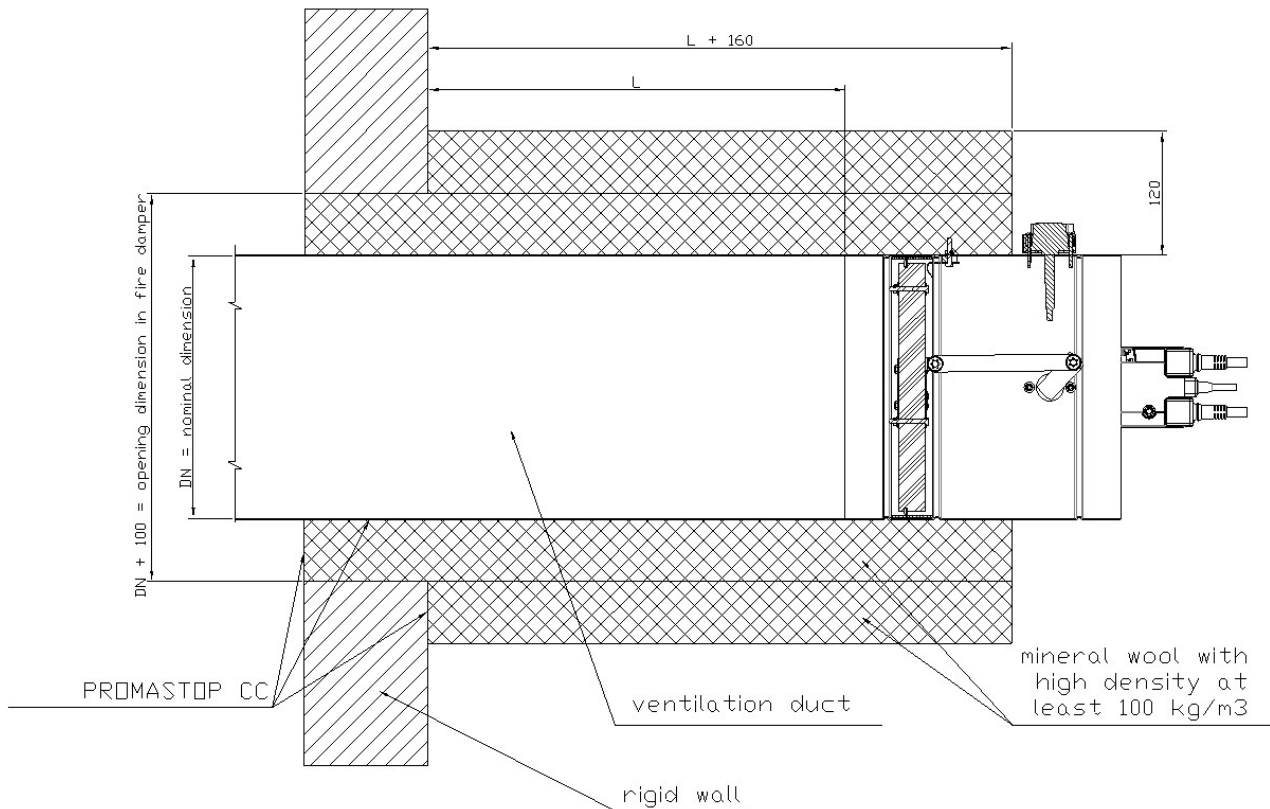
Installation method of KTM-O fire dampers away from wall construction.
